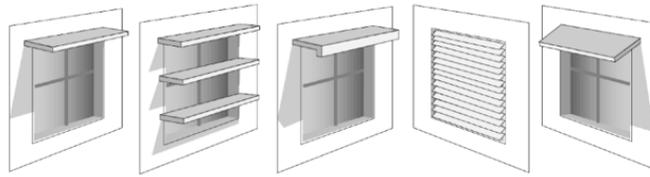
Horizontal Wall Shading (U.S Department of Energy, 2013)
